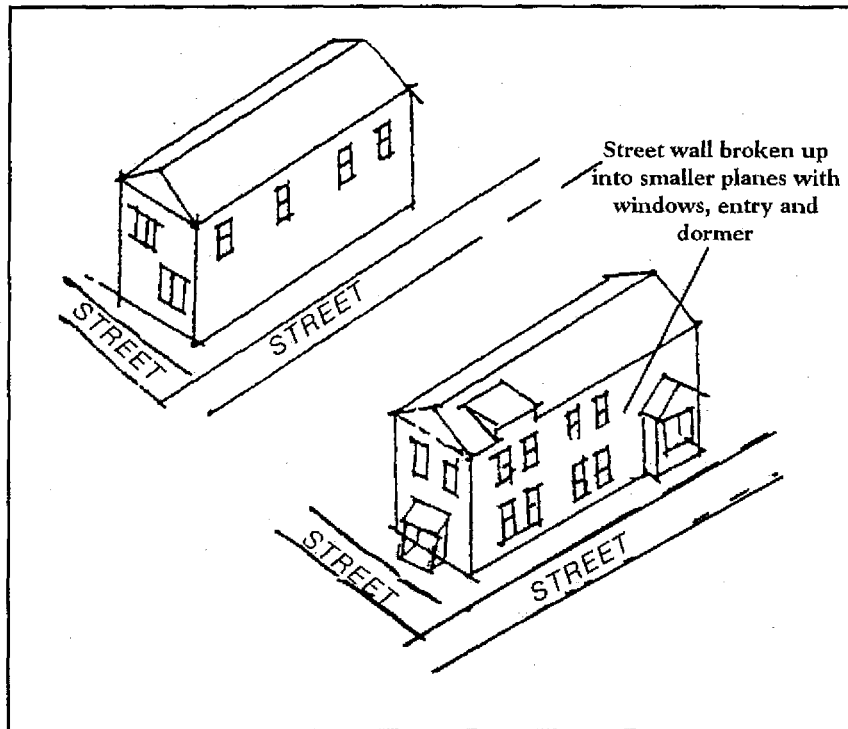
Create visual interest along the street. Incorporate porches, dormers, and bays to reduce scale of buildings and so as to relate better to existing structures.
